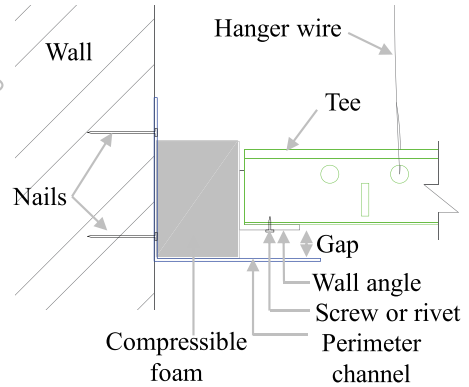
Typical connection details between a fully-floating ceiling and the wall.
